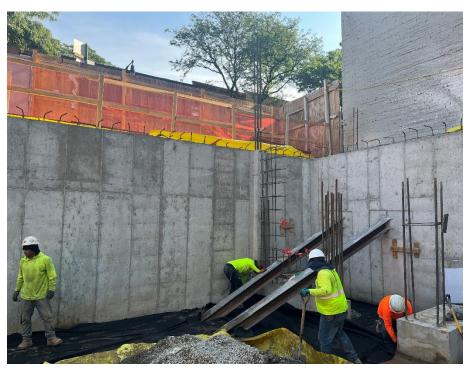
View of contractor installing geotextile fabric, facing northeast.
